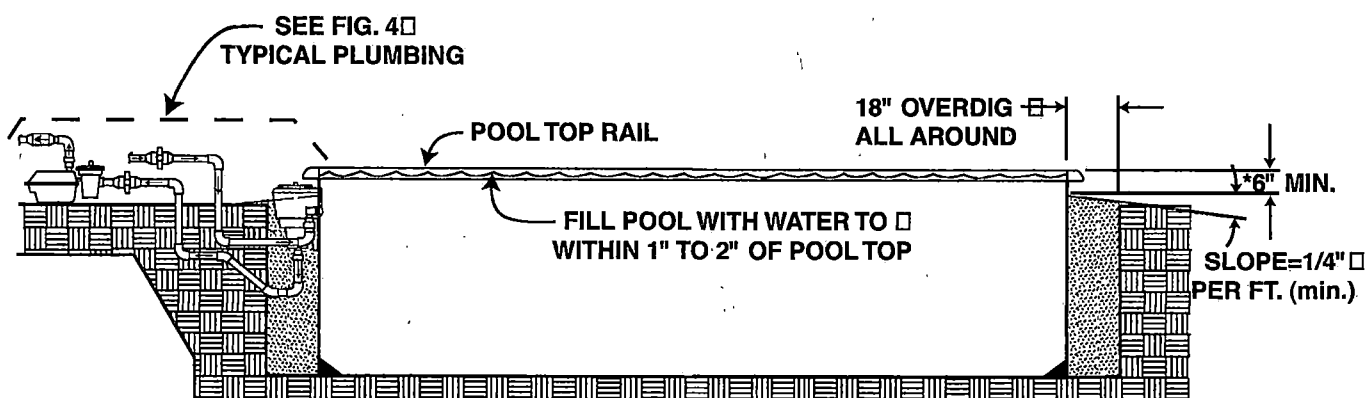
PREPARATION FOR INSTALLATION WITHOUT DECKING
